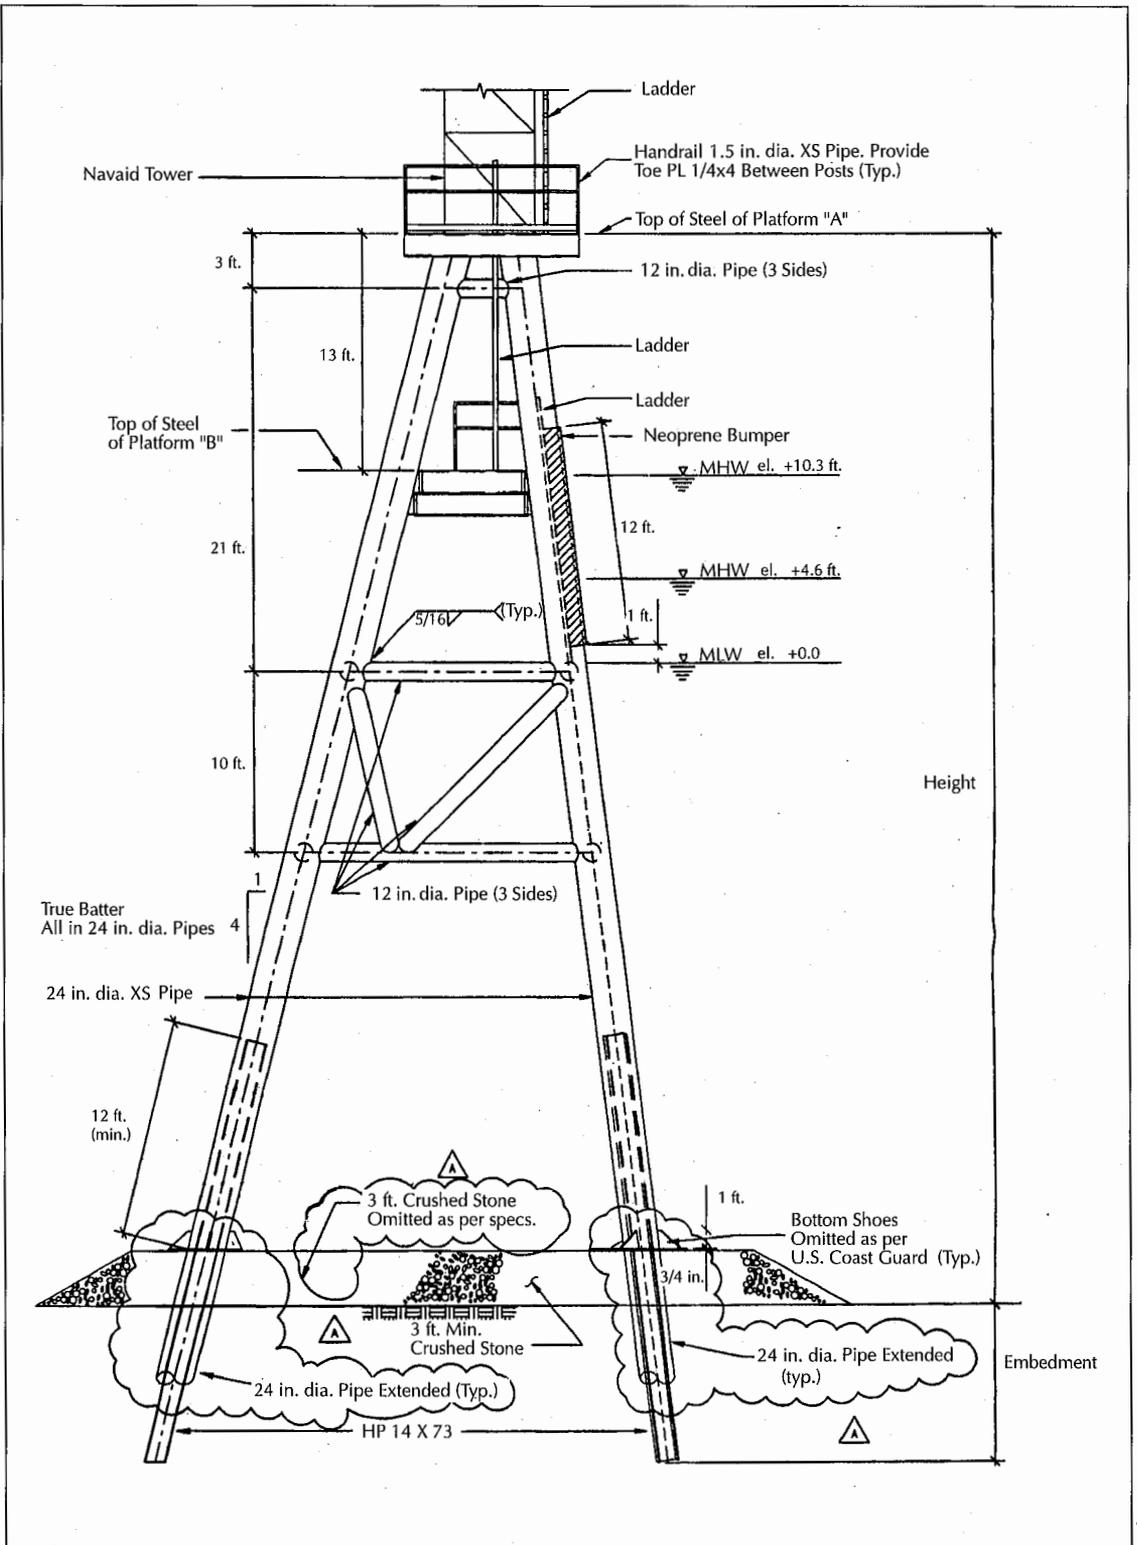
As-built construction drawing of the damaged tower (typical tripod elevation).
